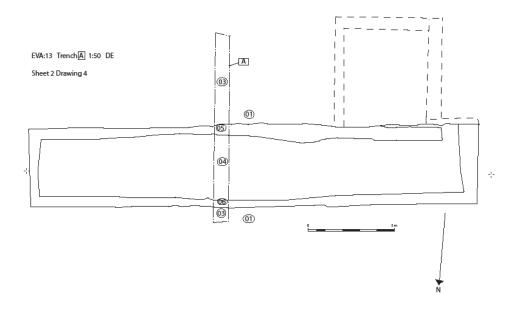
Plan of the air raid shelter based on visible earthworks and the excavations.
